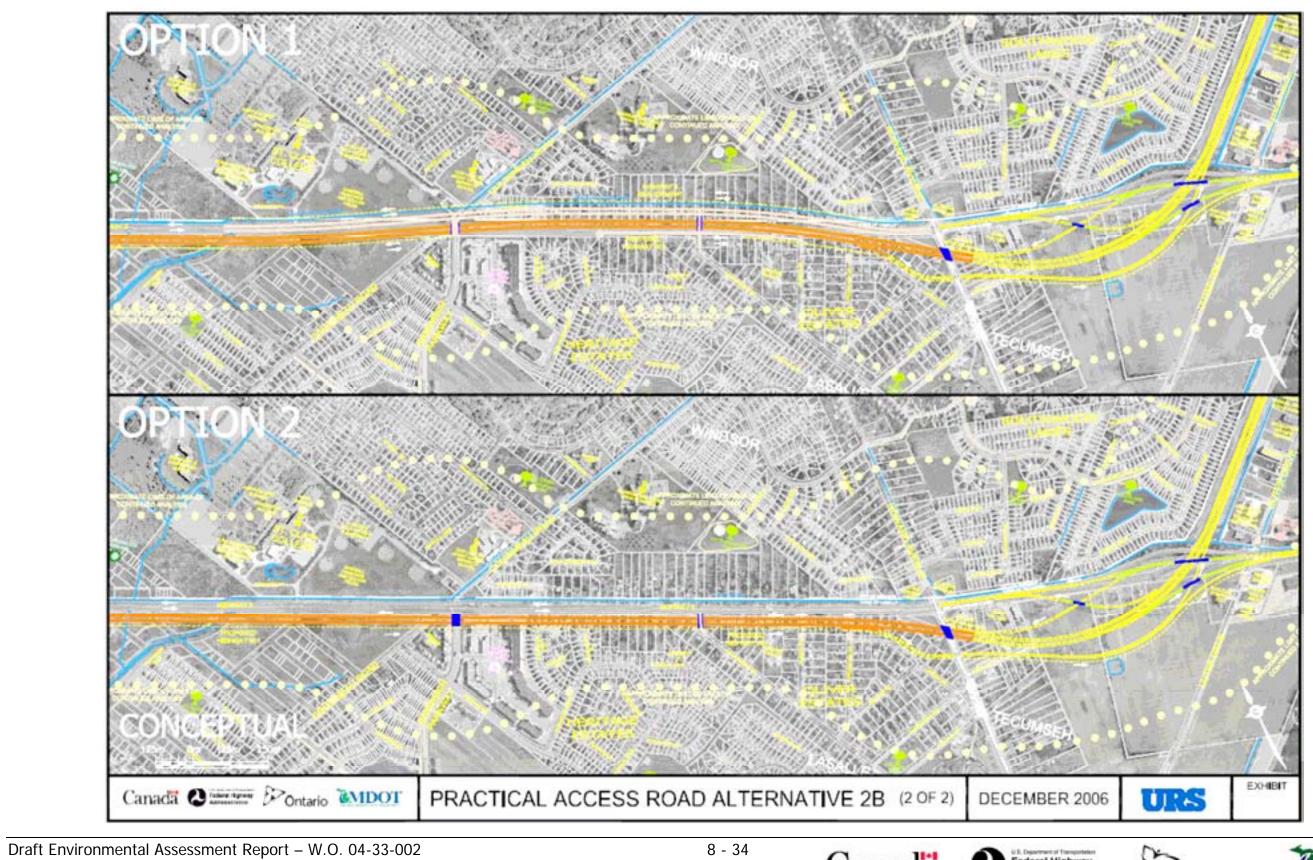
B – PRACTICAL ACCESS ROAD ALTERNATIVE 2B
